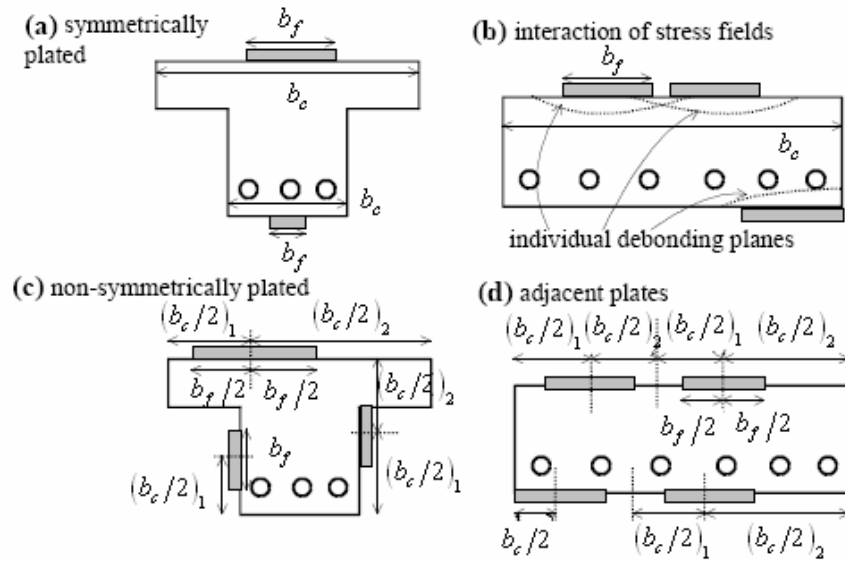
Recommended concrete widths (Oelehers and Seracino 2004)
